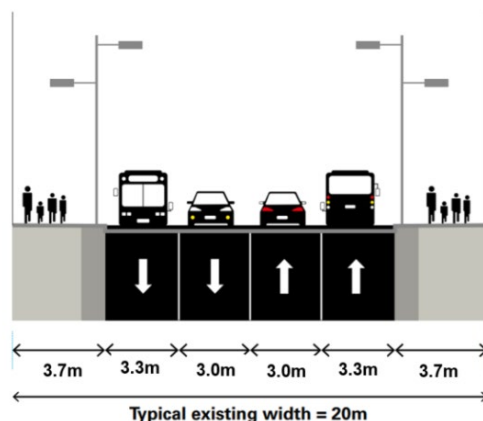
Typical Cross Section from Gerrard Street to Queen Street
